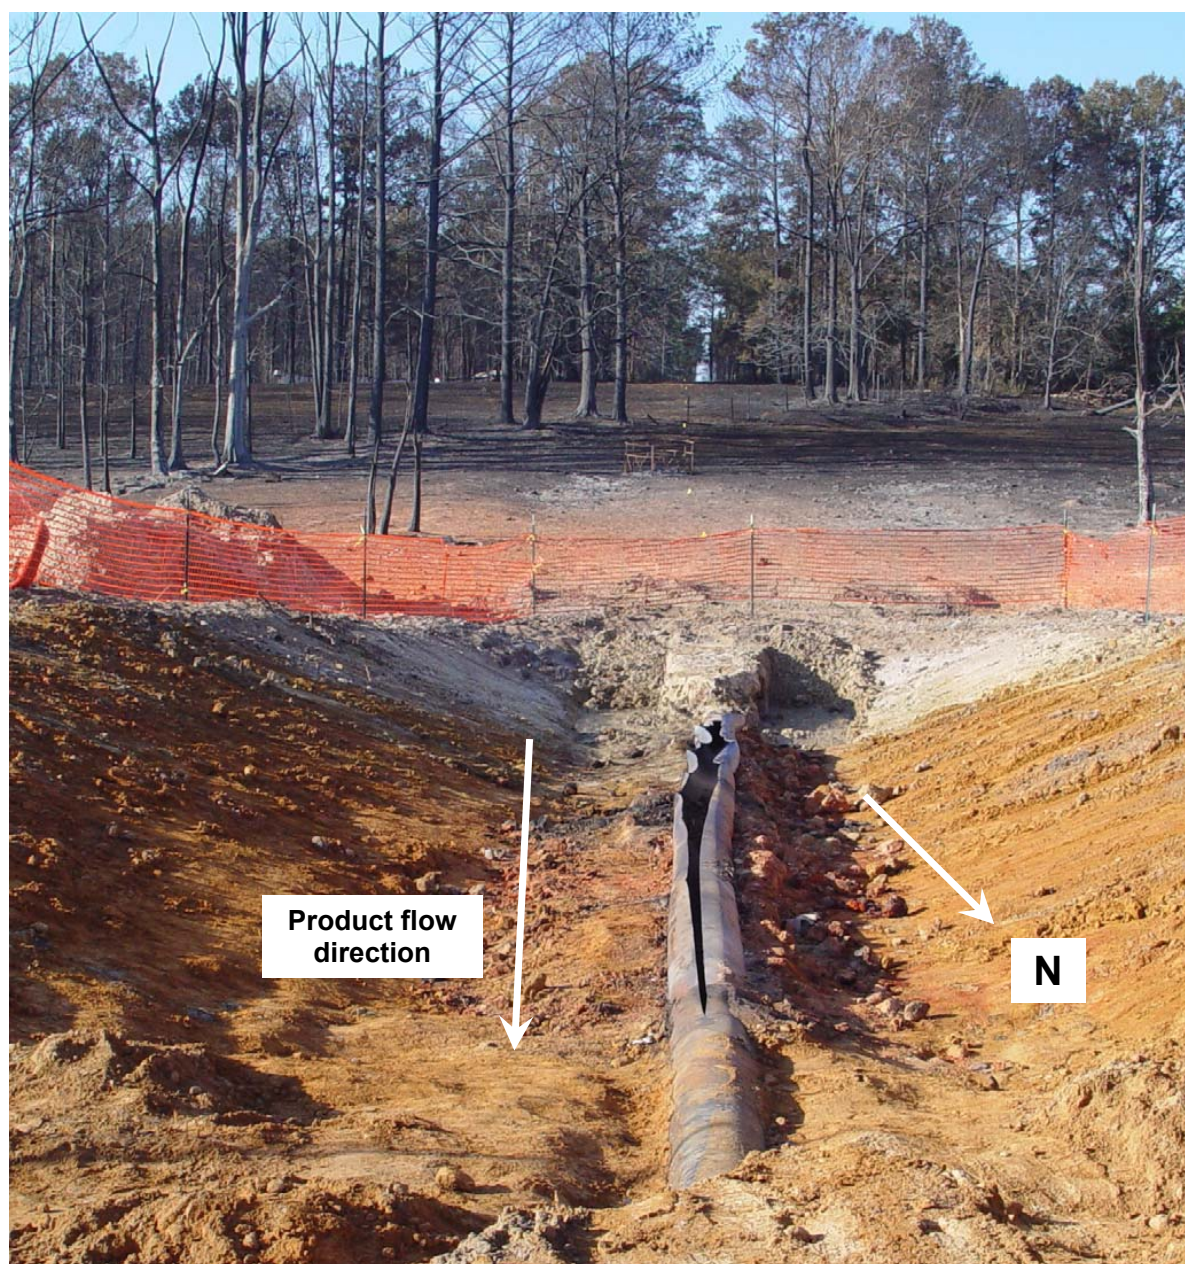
Ruptured pipe at Carmichael looking southwest. (Soil has been removed from around pipe to facilitate on-site examination.)
